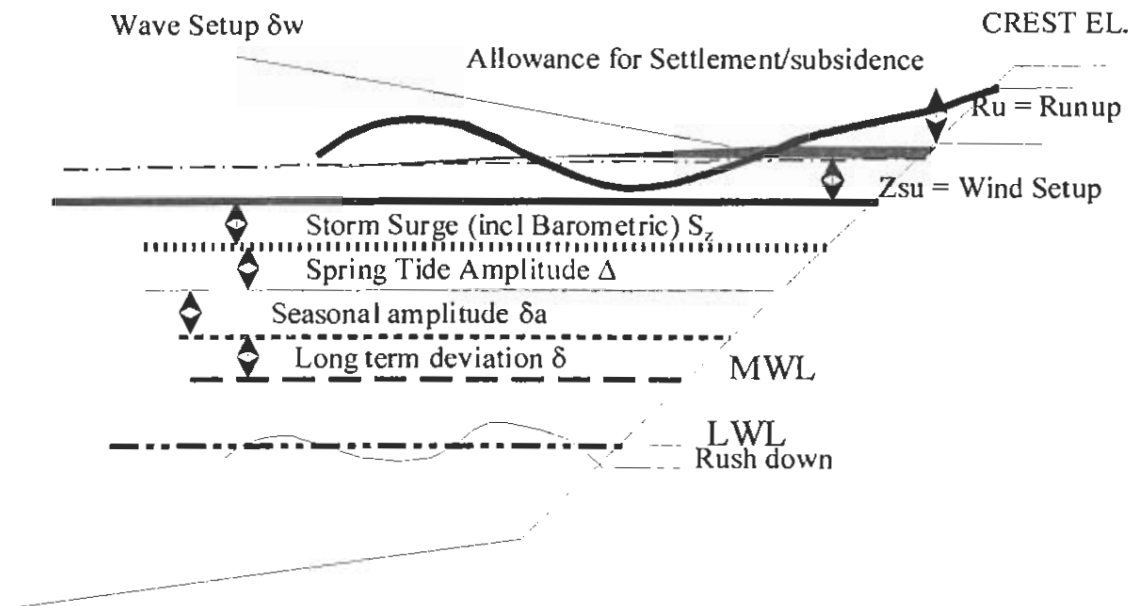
Factors Affecting the Crest Elevation of a Seawall or Breakwater.
